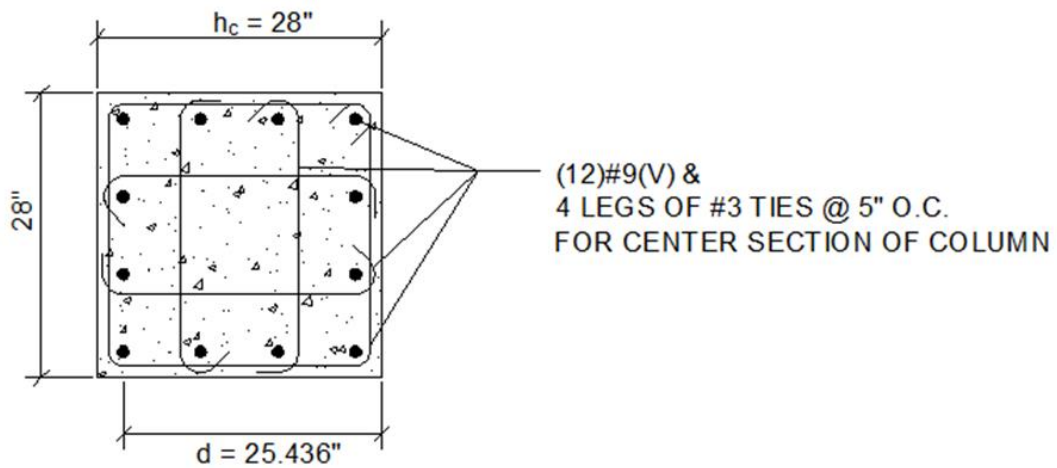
Exterior column, cross-section at center of column at the 3rd floor level based on tsunami design requirements.
